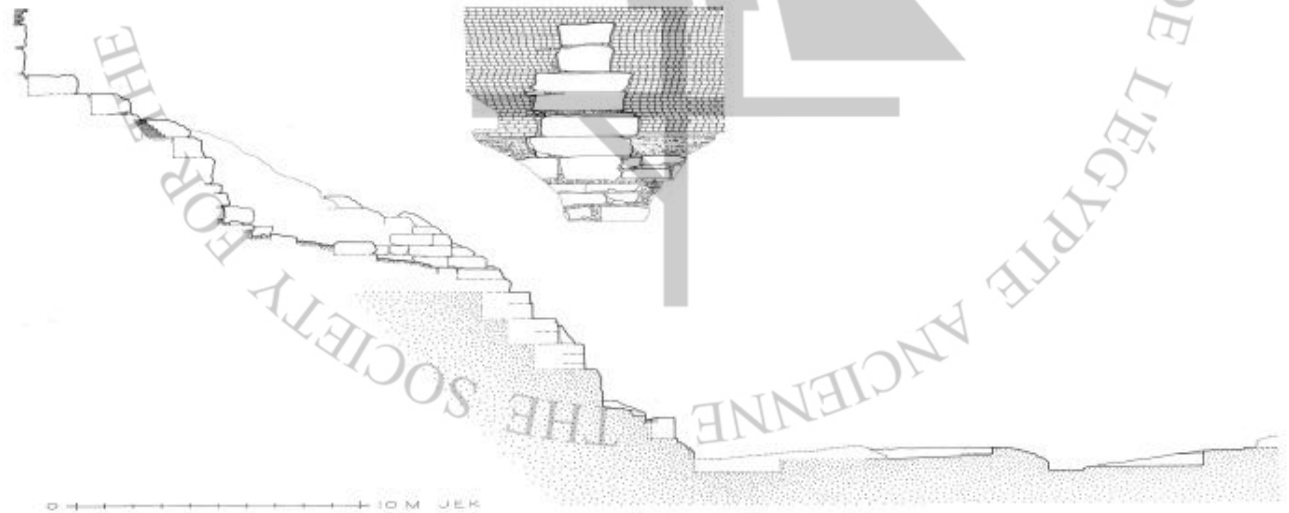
Pyramid E Side: Section, looking N and Elevation of Axial Cross Wall.
